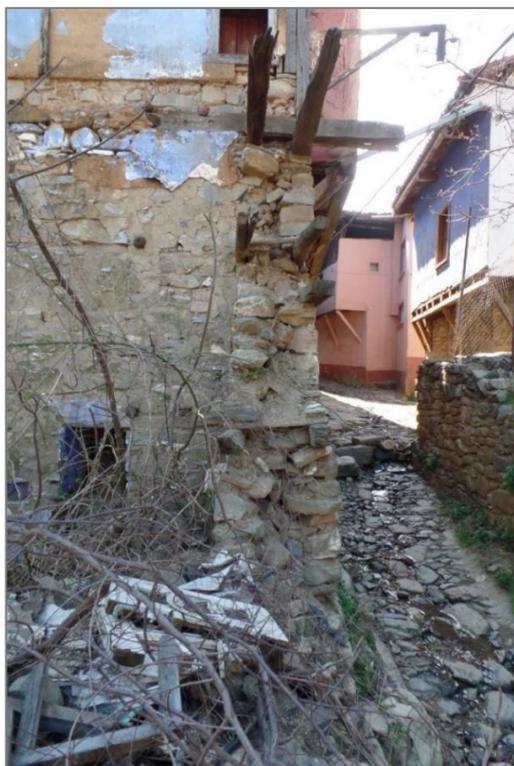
Section from rubble stone masonry wall with timber lintels and tie beams (lot no:2800-36)
